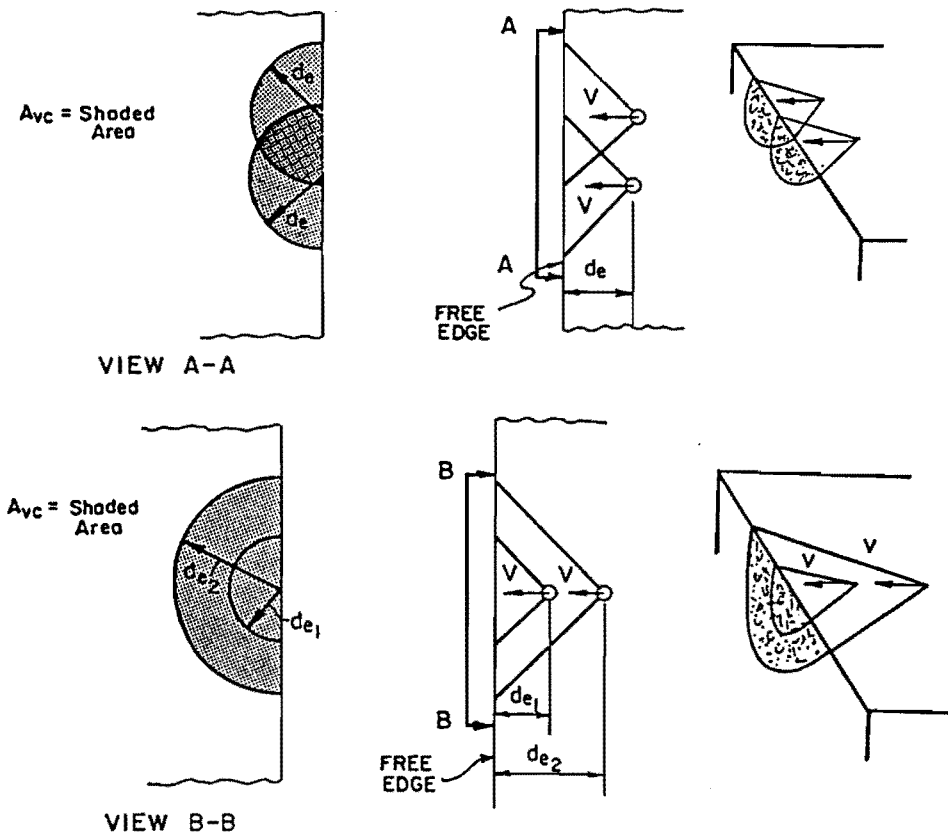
Typical Failure Surface for Multiple Shear Anchors
